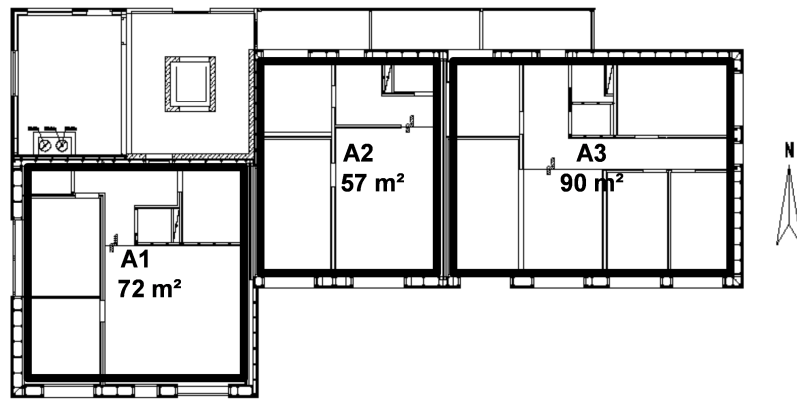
Floor plans of a standard storey of the chosen floor-plan (the building has three storeys)
